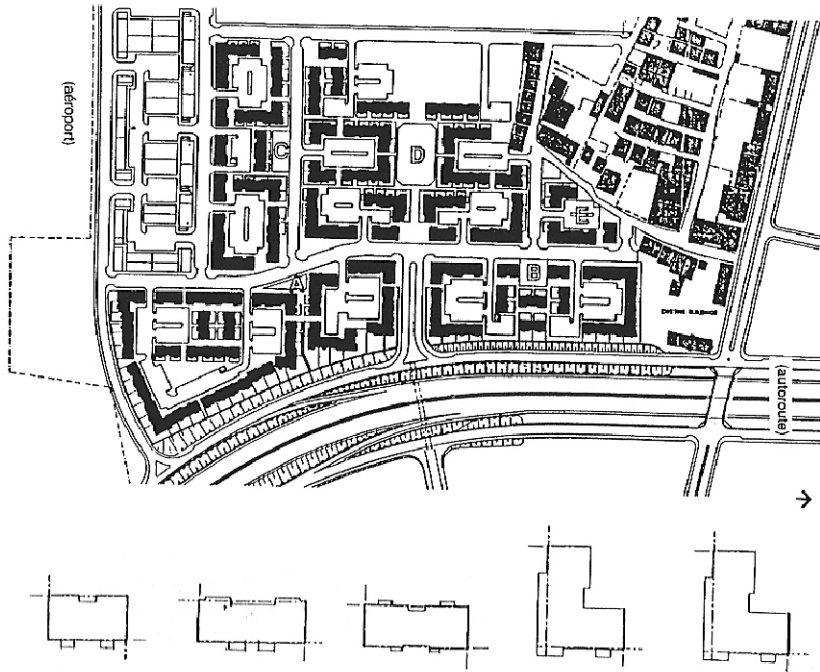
Elyssar Plan: mass plan of 7,500 low-income housing units
